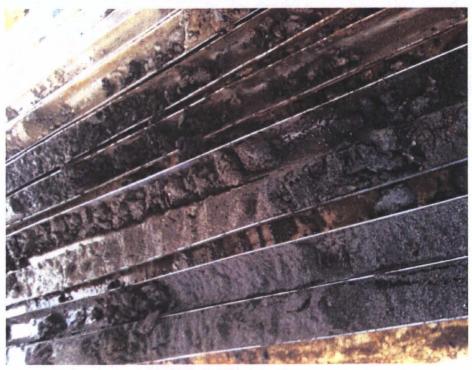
View of cores collected from Boring 5 to 25' feet at Boring T3B4.
